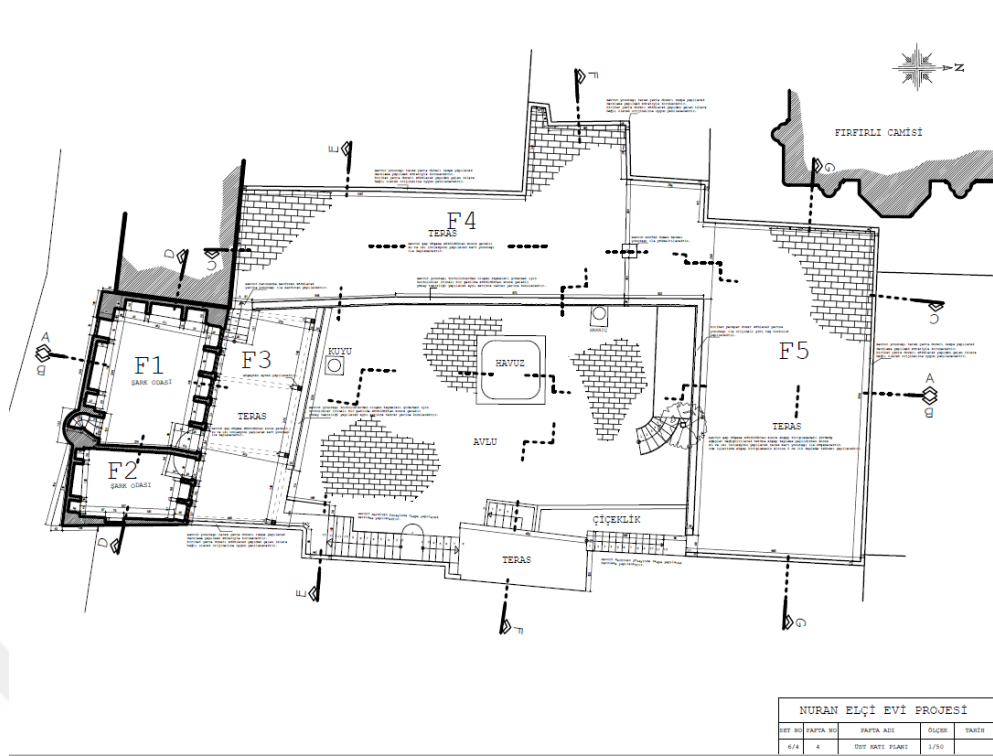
Nuran Elçi mansion restoration project first floor plan (TEMA 2008: 51)
